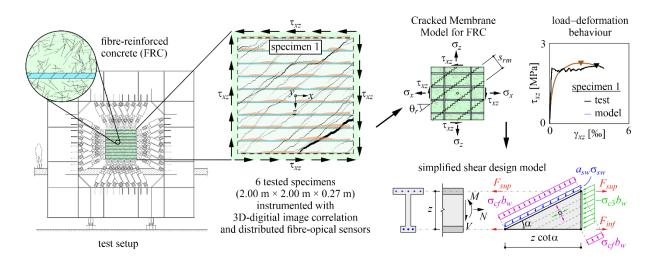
Large-scale fibre-reinforced concrete panel tests in the Large Universal Shell Element Tester (LUSET) at ETH Zurich, building the basis for the development of the Cracked Membrane Model for fibre-reinforced concrete and the derivation of a simplified shear design model for the design of fibre-reinforced concrete structures.
